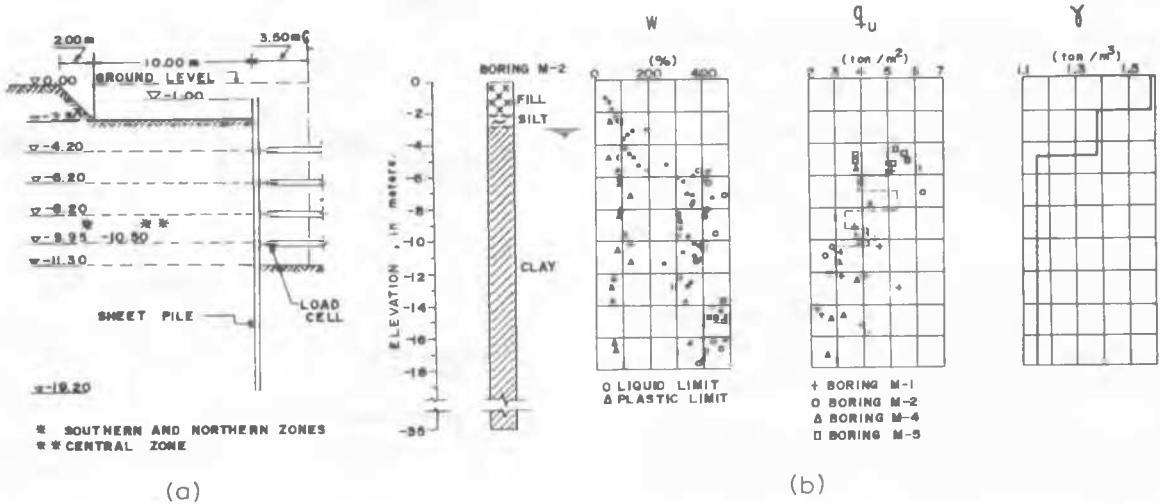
(a) CROSS SECTIONAL VIEW OF EXCAVATION.
